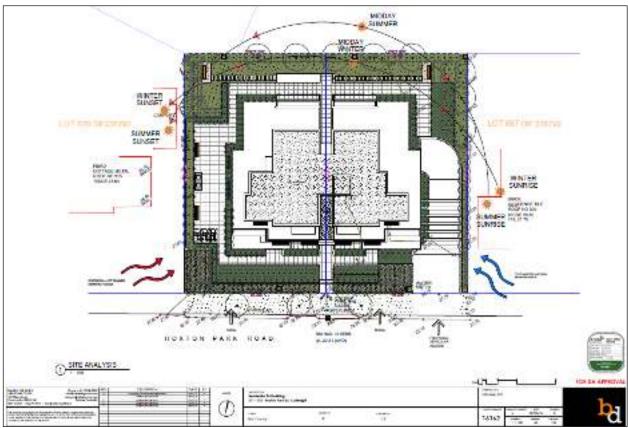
Proposed Site Analysis Plan (source: 16162-4 Rev E prepared by Baini Design).
